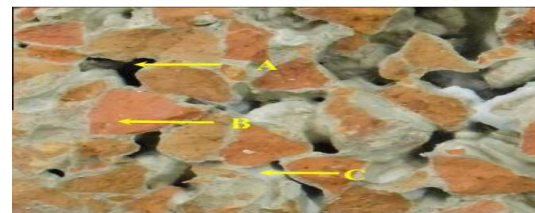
Fracture surface of PGC containing RB ; (A) open porosity ; (B) fractured RB ; (C) geopolymer paste [5]
